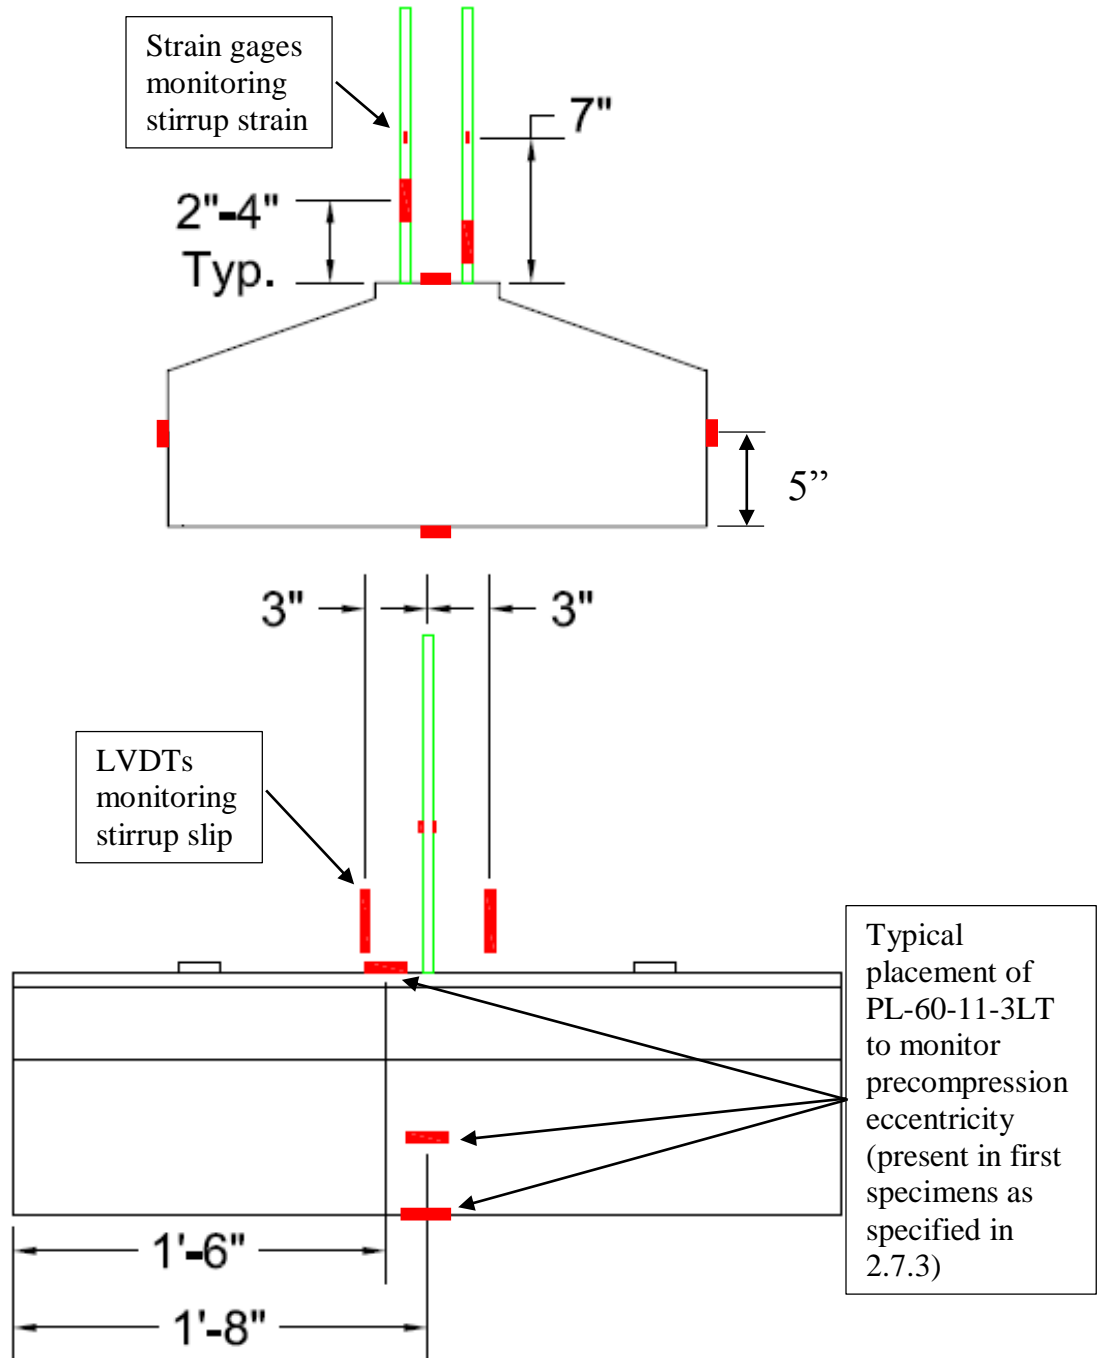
Plan (top) and elevation (bottom) views of instrumentation used to monitor a typical subassembly specimen.
